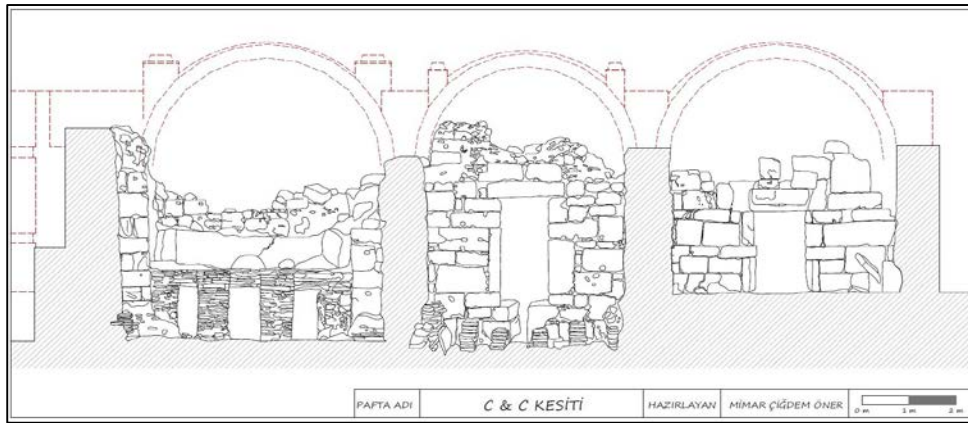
Bath Structure C-C Section Restitution Proposal 2
